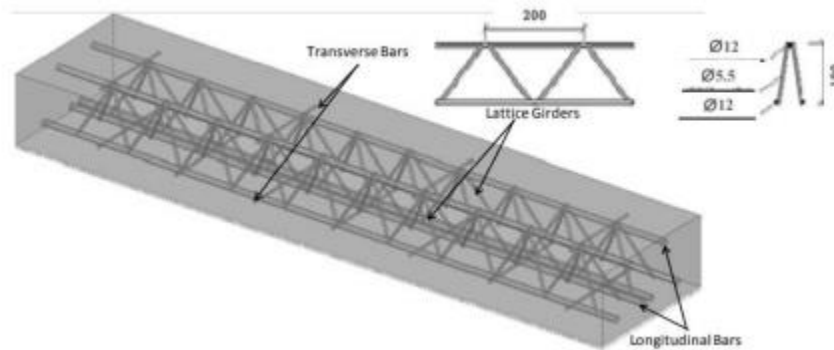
Monolithic concrete beam with lattice girders as reinforcement (Tapan, 2014)
